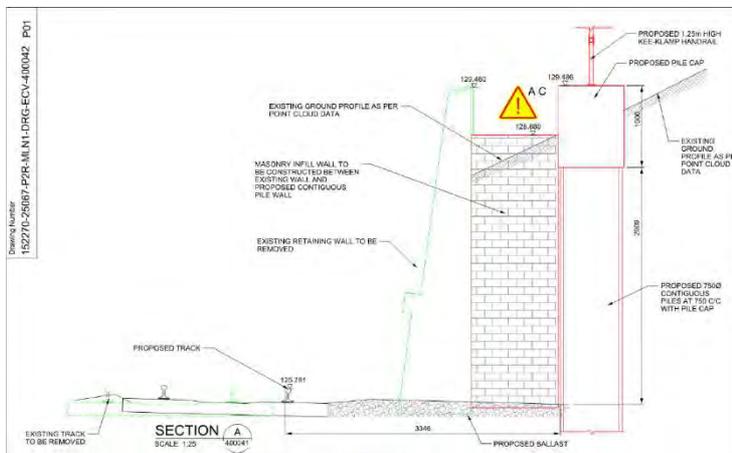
Proposed masonry infill between the existing masonry wall and new piled wall
